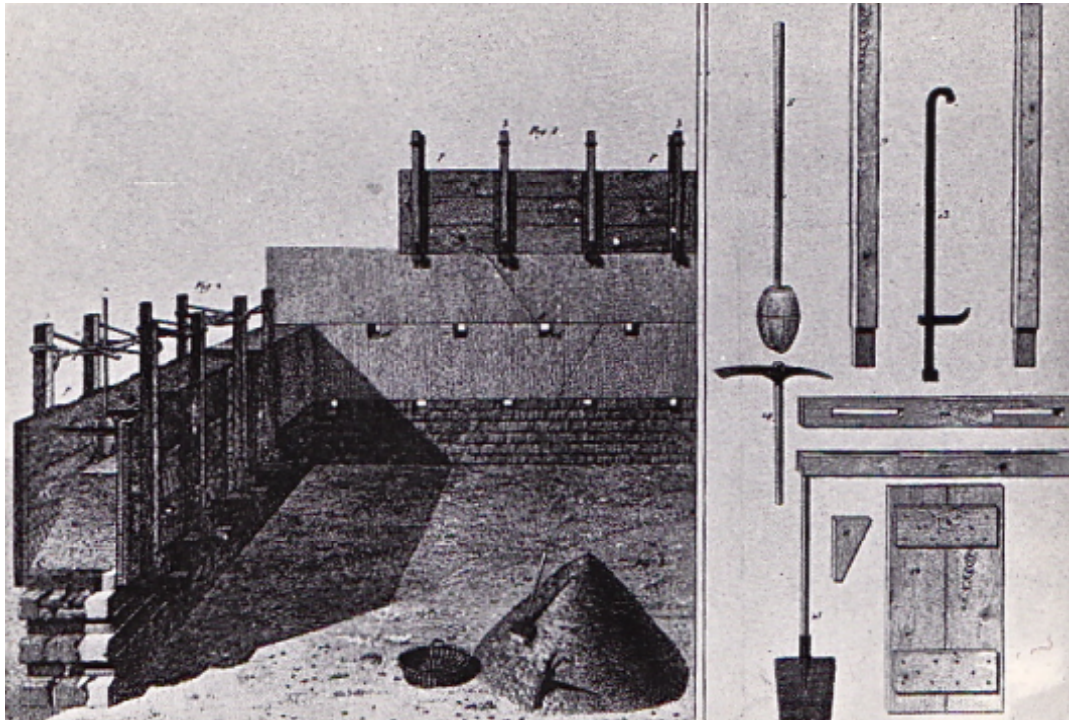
An early illustration of the method used for building 'pise' clay and earth structures showing the shuttering of one 'lift' in position. A similar method of construction was used on early concrete structures such as the New Jerusalem Church, FIGURE 05. (Acknowledgements: from Rondelet: 'Traite de l'Art de Batir' (1812) in Collins, P, 1959).
